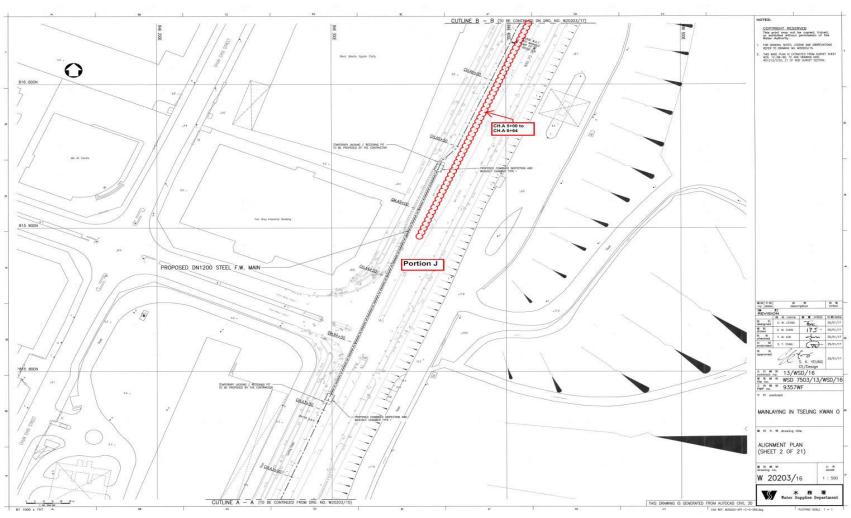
Location Plan for Portion J - CH.A 5+00 to CH.A 6+64
